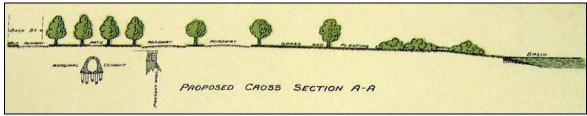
Cross section from Shurcliff's 1929 plan showing location of Back Street, Marginal Conduit and 1910 seawall in relation to the proposed parkland, as well as proposed plantings and the new water's edge (DCR archives).
